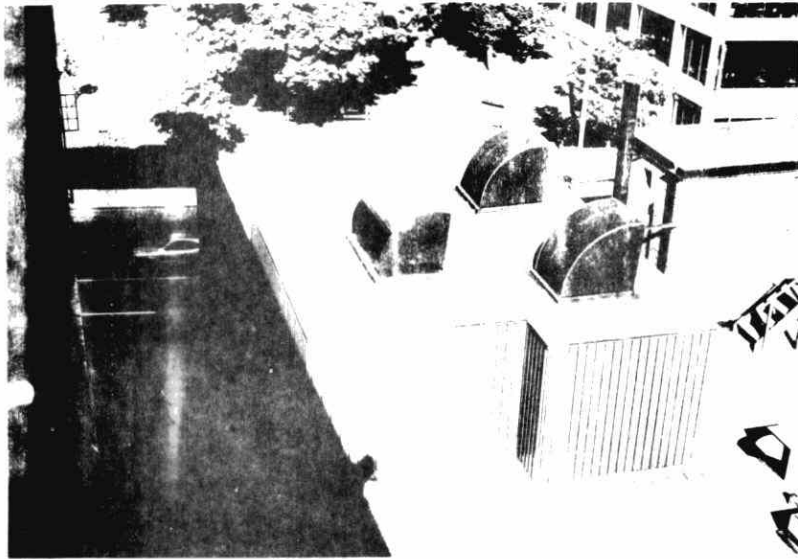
Enclosed Central Air Conditioning Plant on Roof of Kovac's Building.
